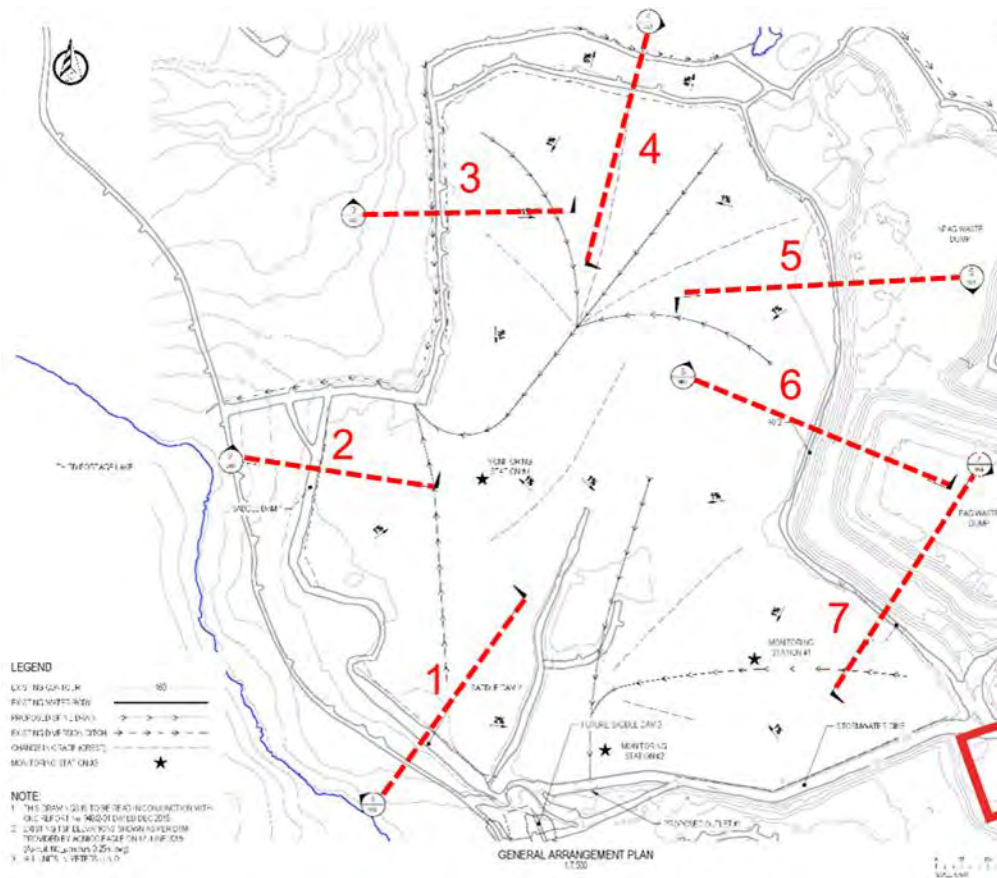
Plan view of Meadowbank TSF with slope stability and seepage analysis cross section locations.
